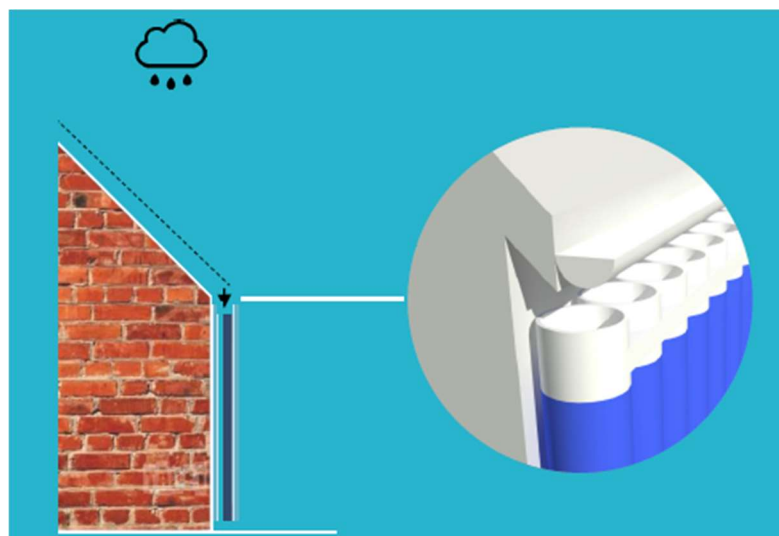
Water inlet through the gutter into the water wall (Source: Anfibia Solutions)
